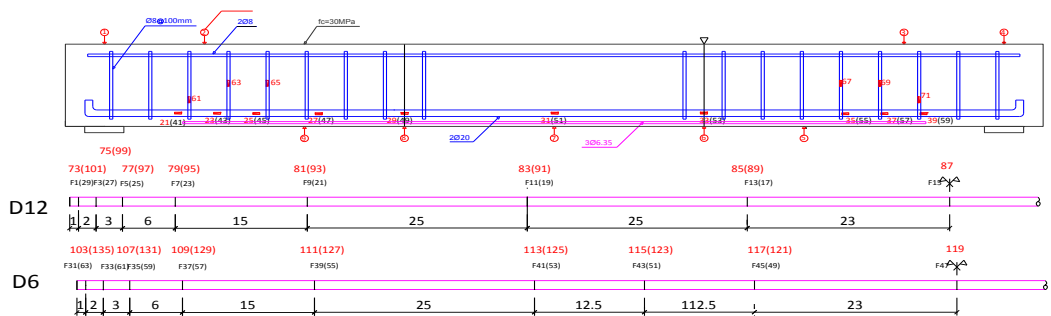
2: (a): LVDTs arrangement along the beam - (b): Strain gauge arrangement in various components
